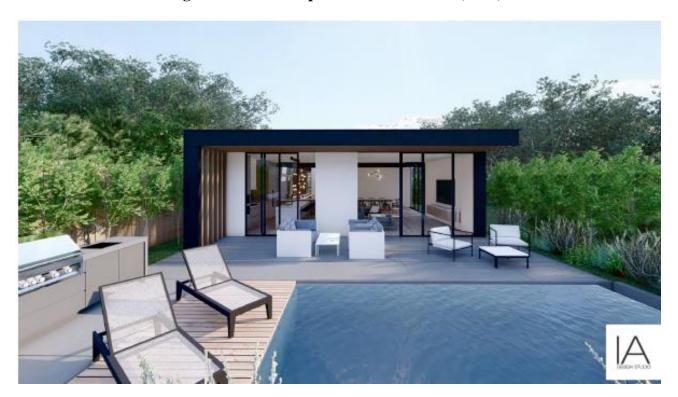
Lot 1 Proposed South Elevation (Side)
